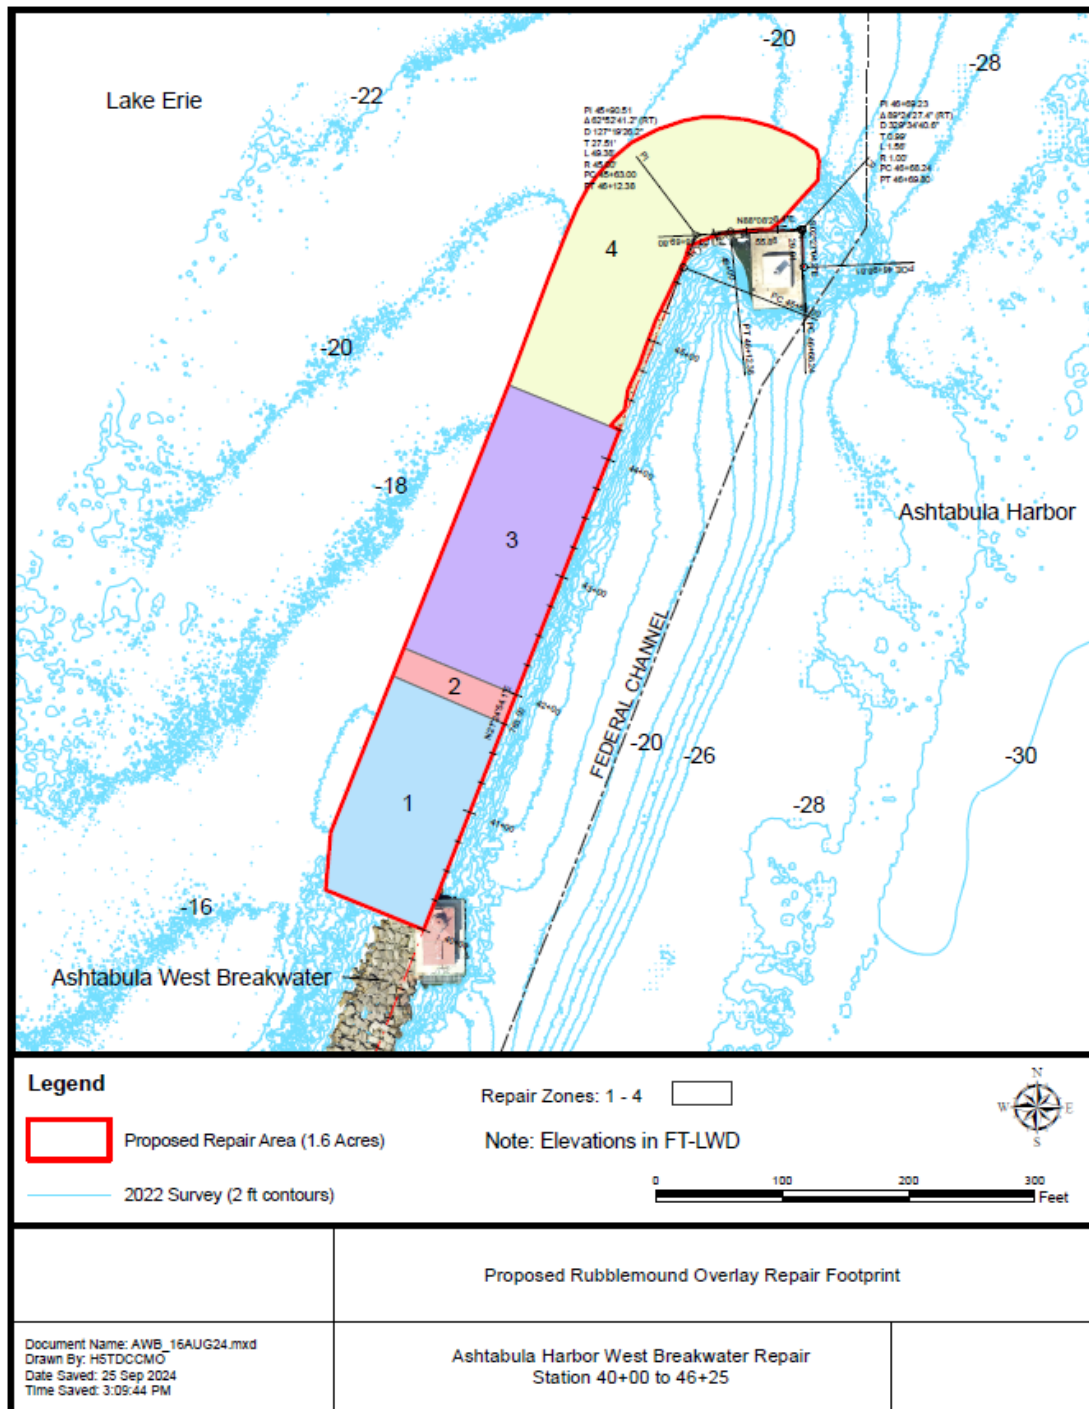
Ashtabula Western Breakwater Proposed Repair Footprint with Sections
